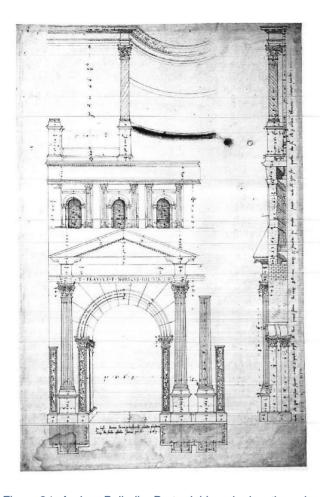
Andrea Palladio, Porta dei Leoni, elevation, plan and section of the later facade, London, RIBA, Palladio XII, 20r
